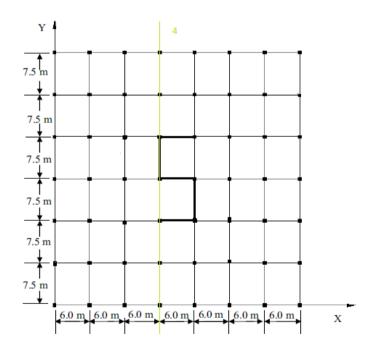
Typical floor plan for the buildings (element sizes not to scale)
